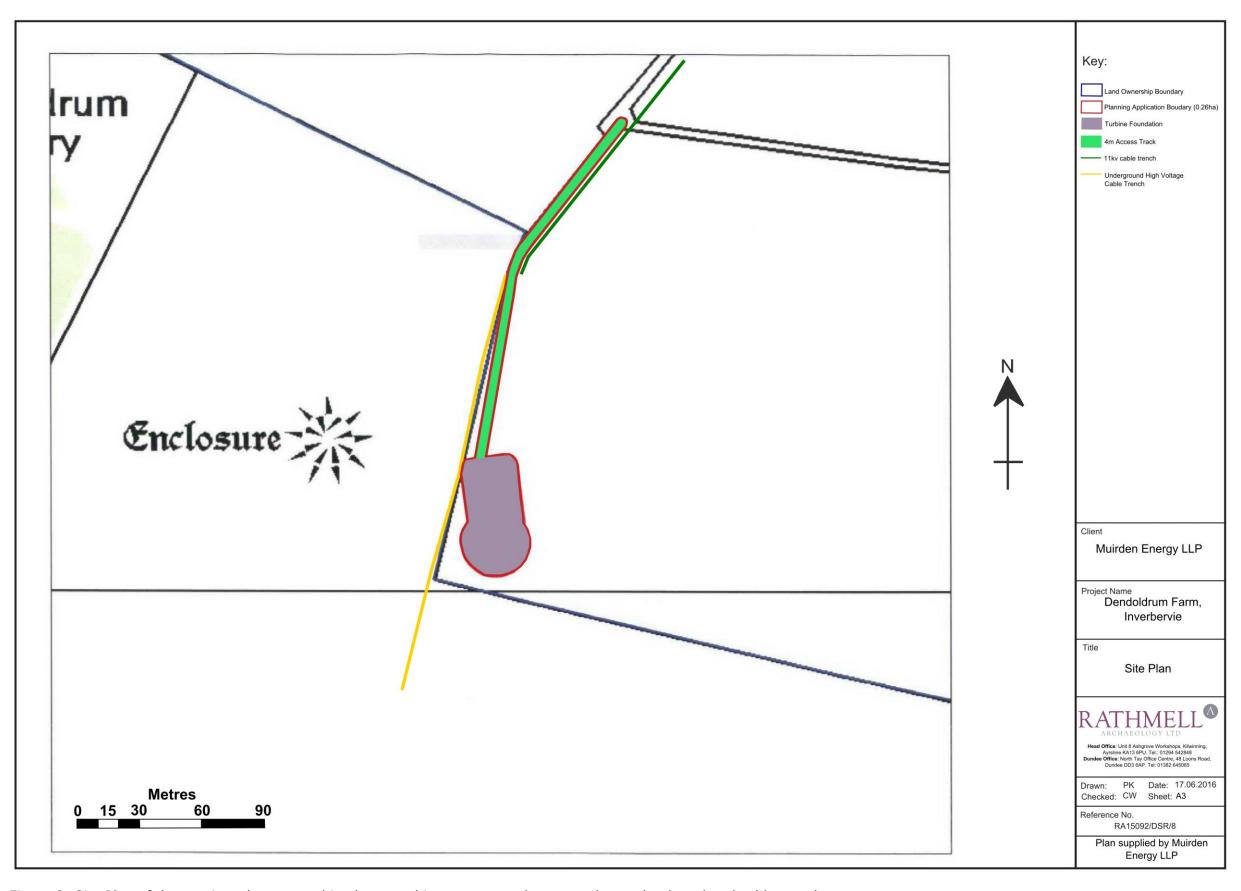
Site Plan of the monitored areas: turbine base, turbine storage and crane pad area, haul road and cable trench
